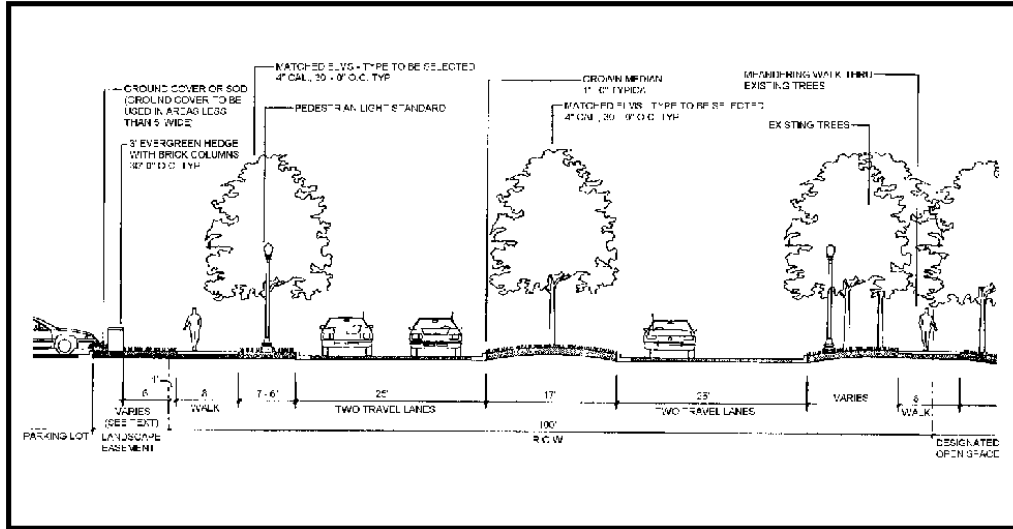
Bear Creek Parkway (Divided Cross Section)
